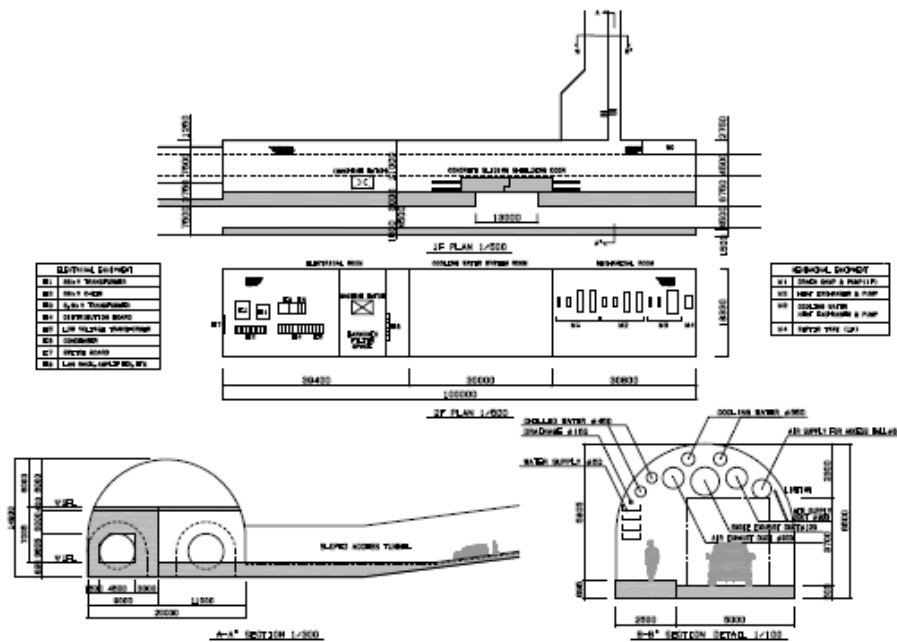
Detail of an access ramp for the Asian Sample Site
